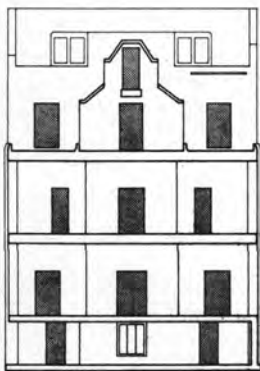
12 openings were created in the wall of the old building to connect the old and new parts.
